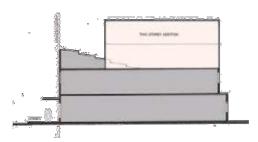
Sectional illustration of single-storey addition with appropriate front setback (a slightly greater than proposed minimum 6 metres front setback shown here in order to coincide with the stepping down element of the side parapet for a better design outcome).
